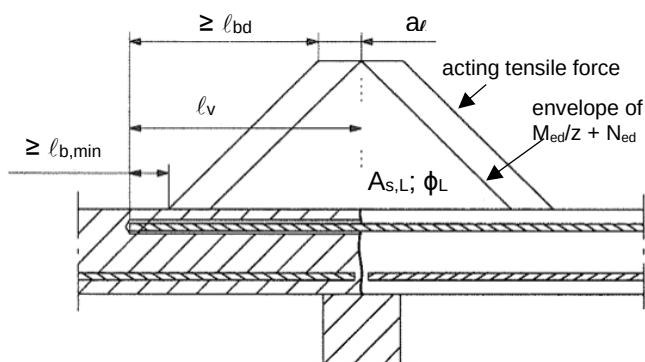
Overlapping joint at a foundation of a wall or column where the rebars are stressed in tension
